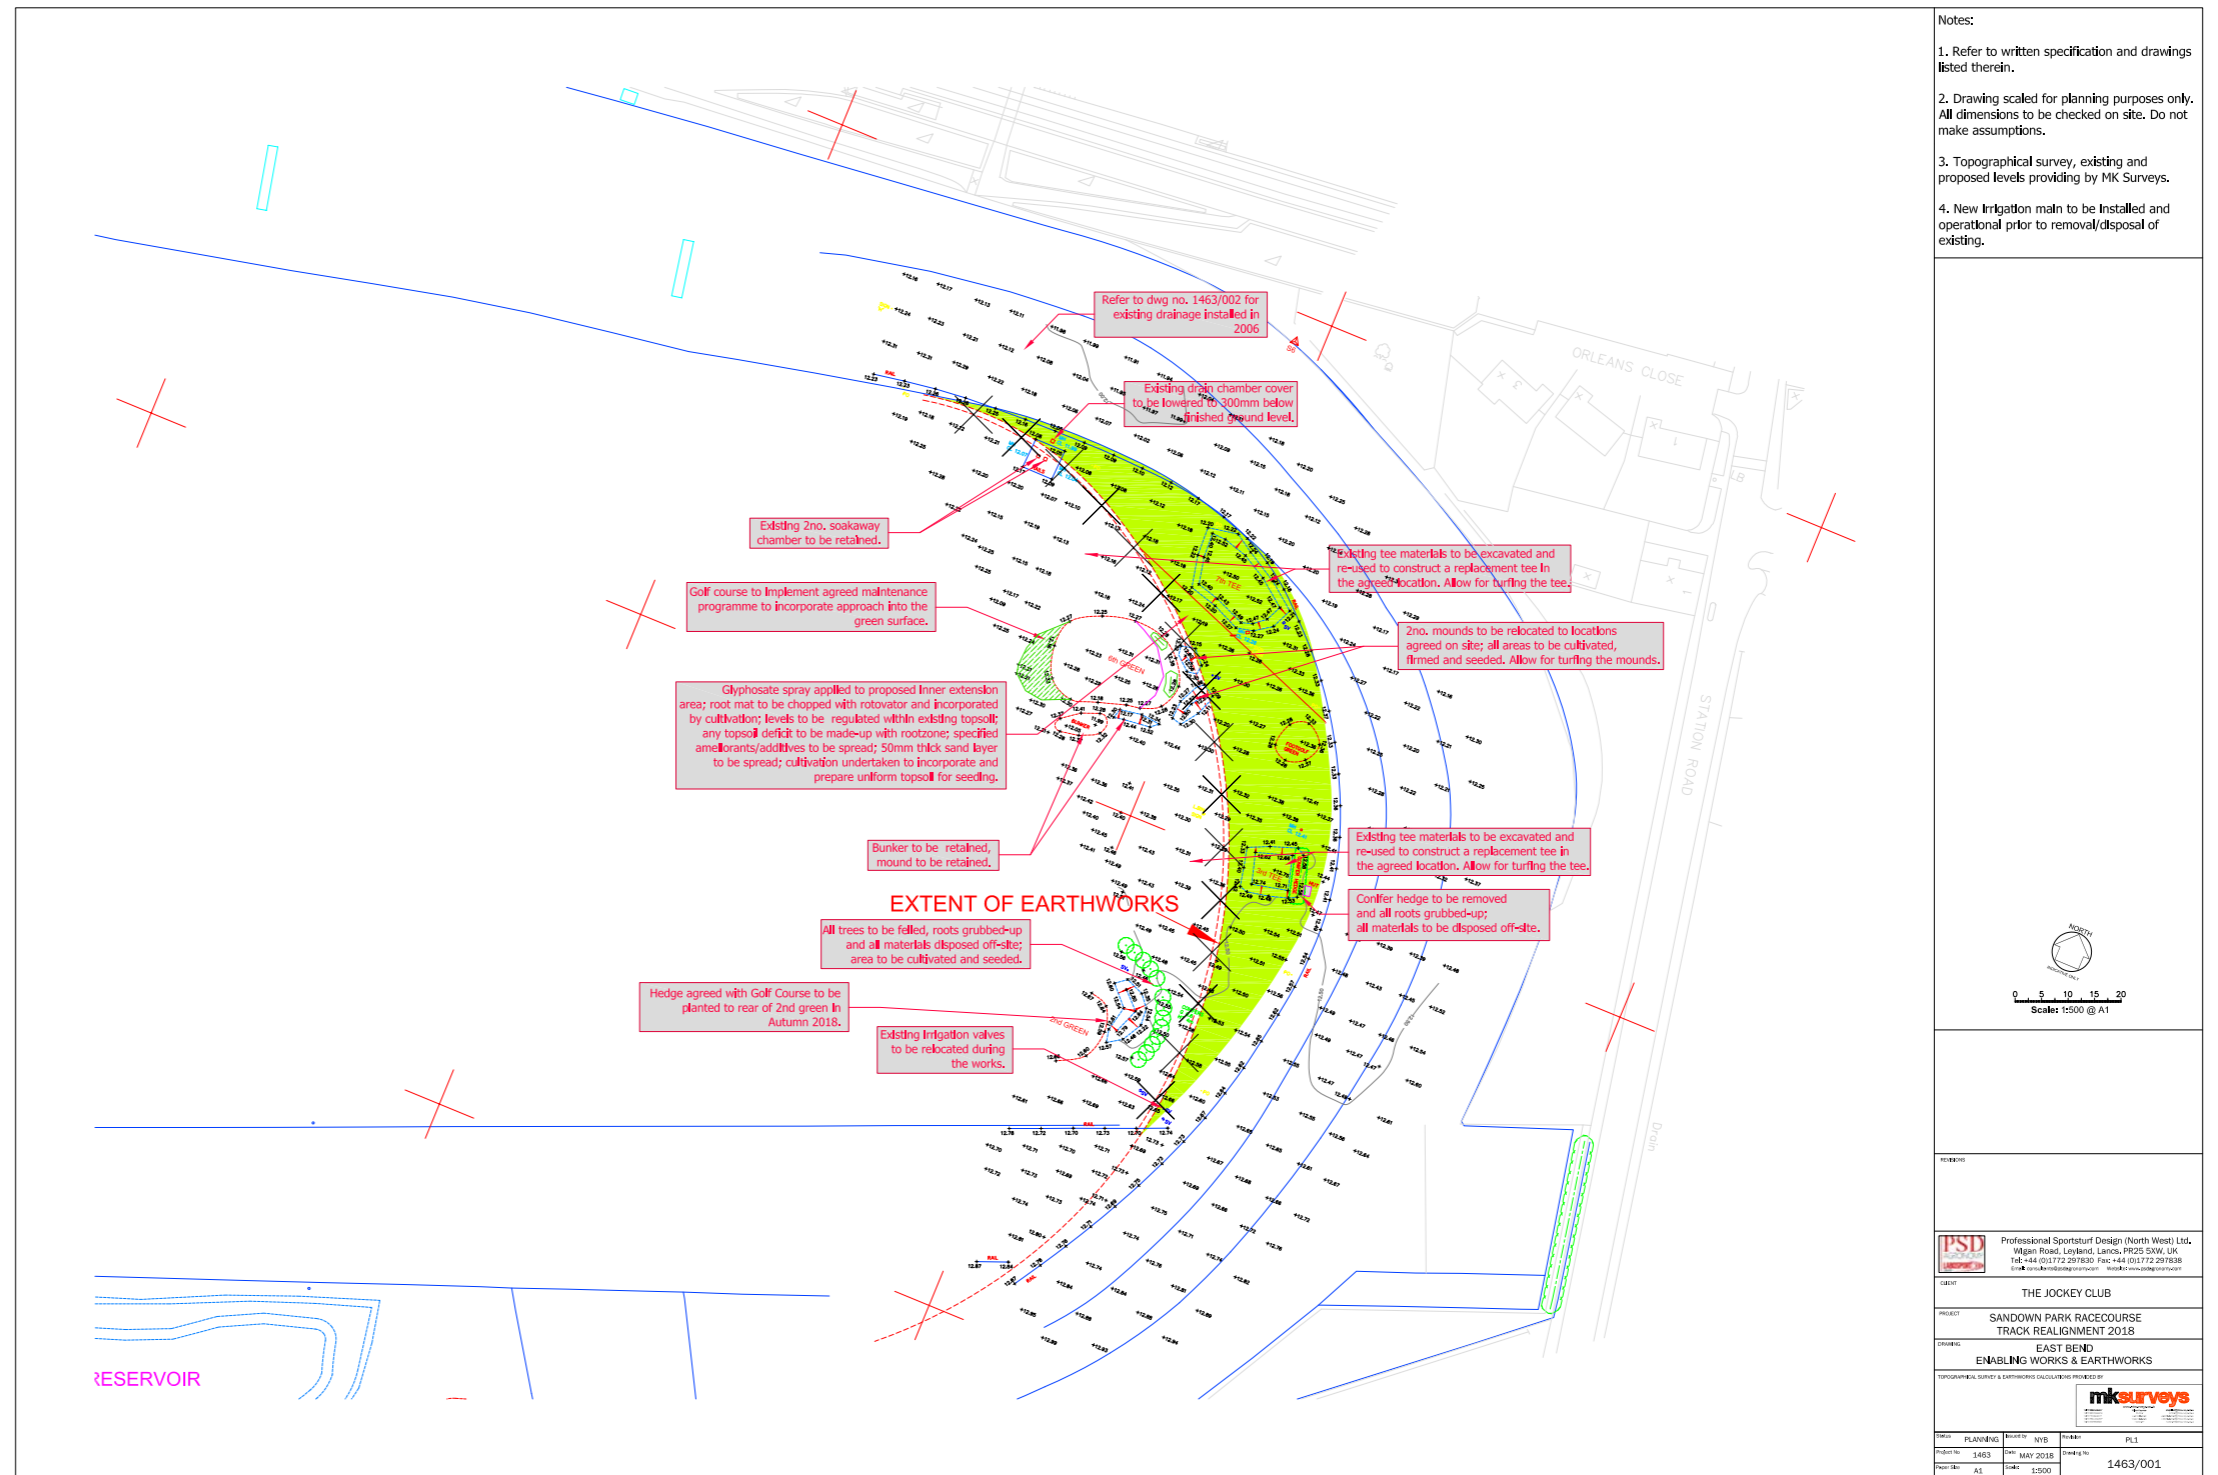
Proposed Layout Site E2 - Refer to Application Drawing 1463 001 P3
